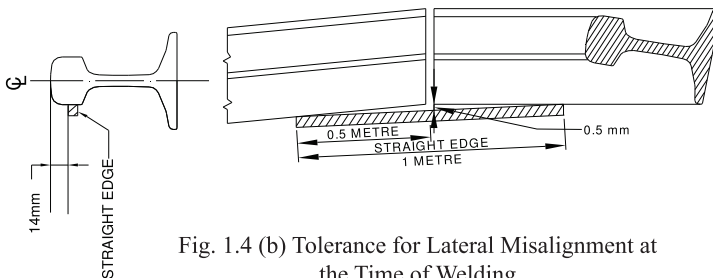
(b) Tolerance for Lateral Misalignment at the Time of Welding
